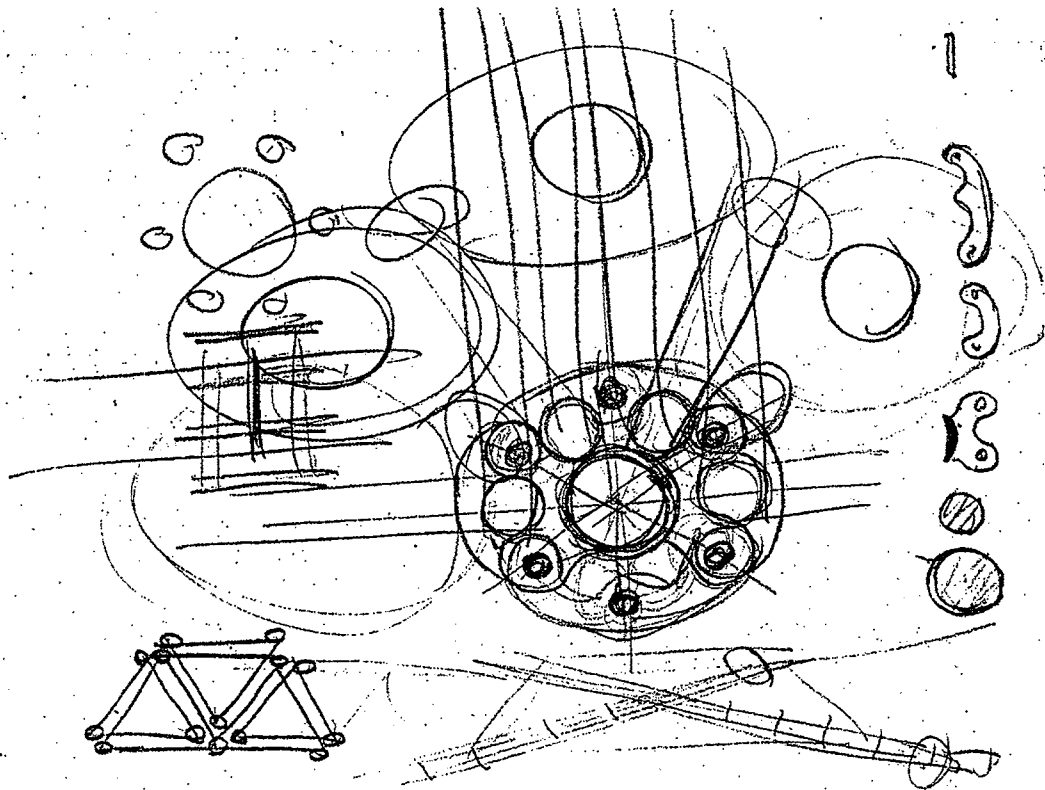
Section and elevation of the beam cut and connection that form the horizontal space frame.
